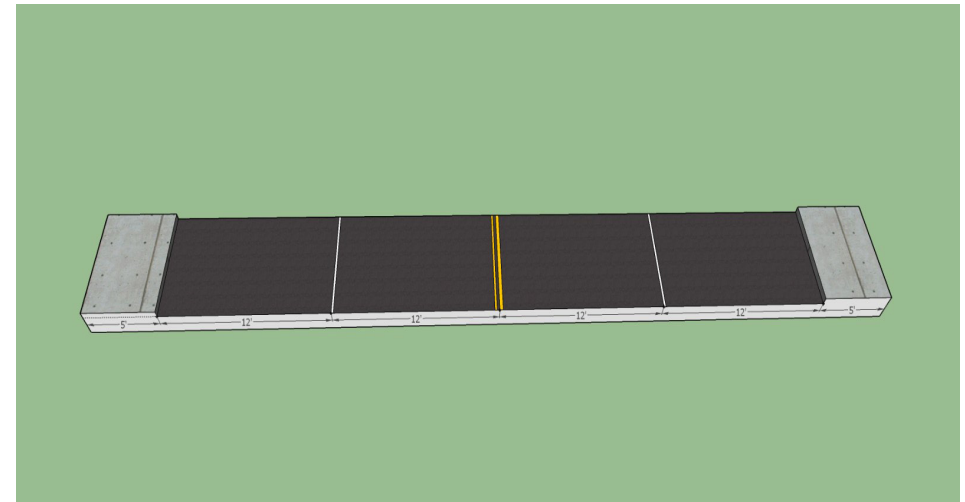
Current design of Clifton Street bridge over I-20 between East Atlanta and Kirkwood
